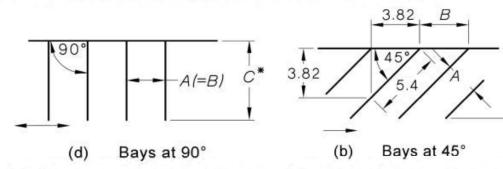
Excerpt of 90-degree parking spaces layout from AS2890.1 Figure 2.2
